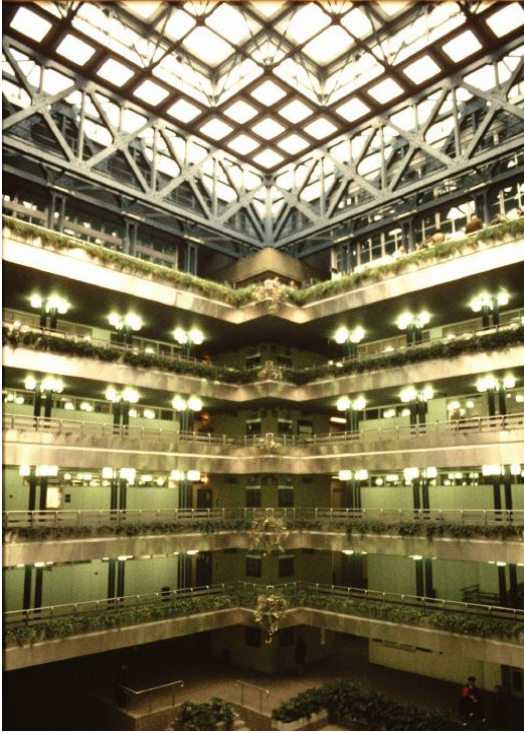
The tower and the suspended floors from the Court in Ancona, Italy (Mazzolani) [159] by courtesy of F.M. Mazzolani
